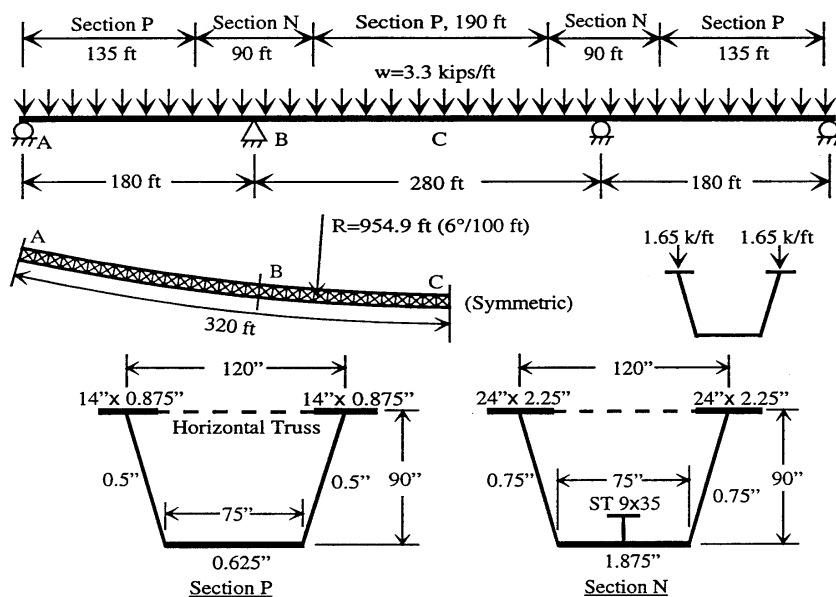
Layout and Cross-Sectional Dimensions of the Bridge (Fan (1999))
